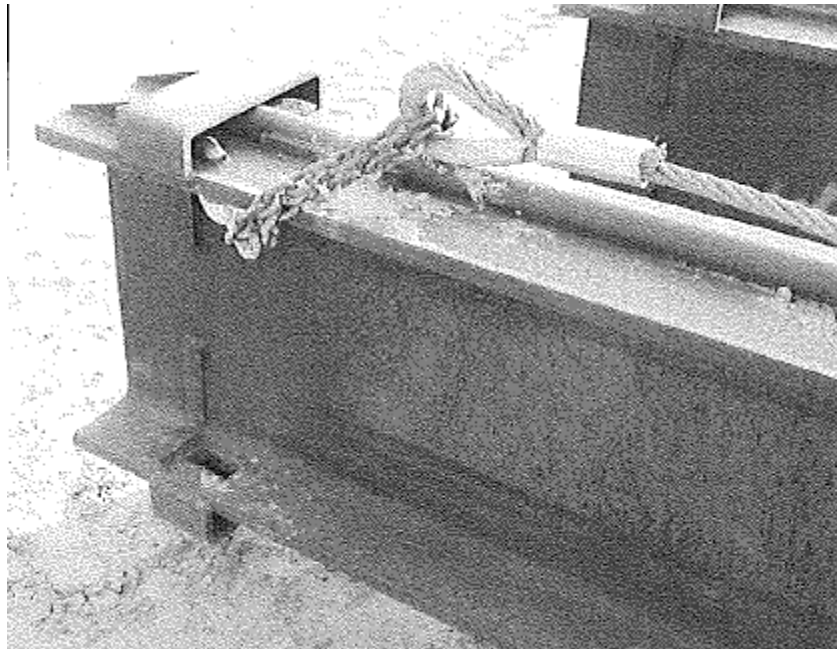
MV-pile (van Paassen, B.P.H., van Dalen, J.H, 2009)
